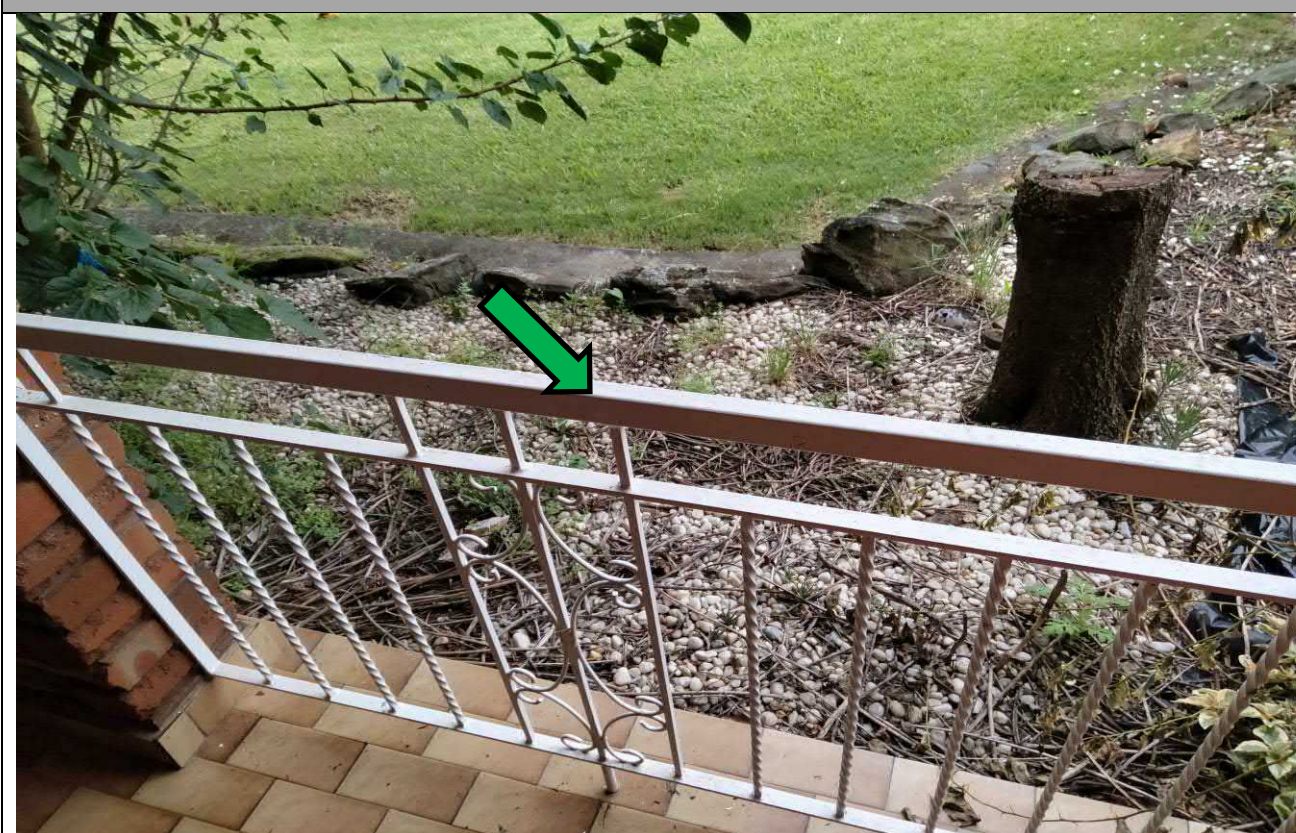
Main building, railings and fences, non-lead containing white paint system, as observed on 18/01/2022.
